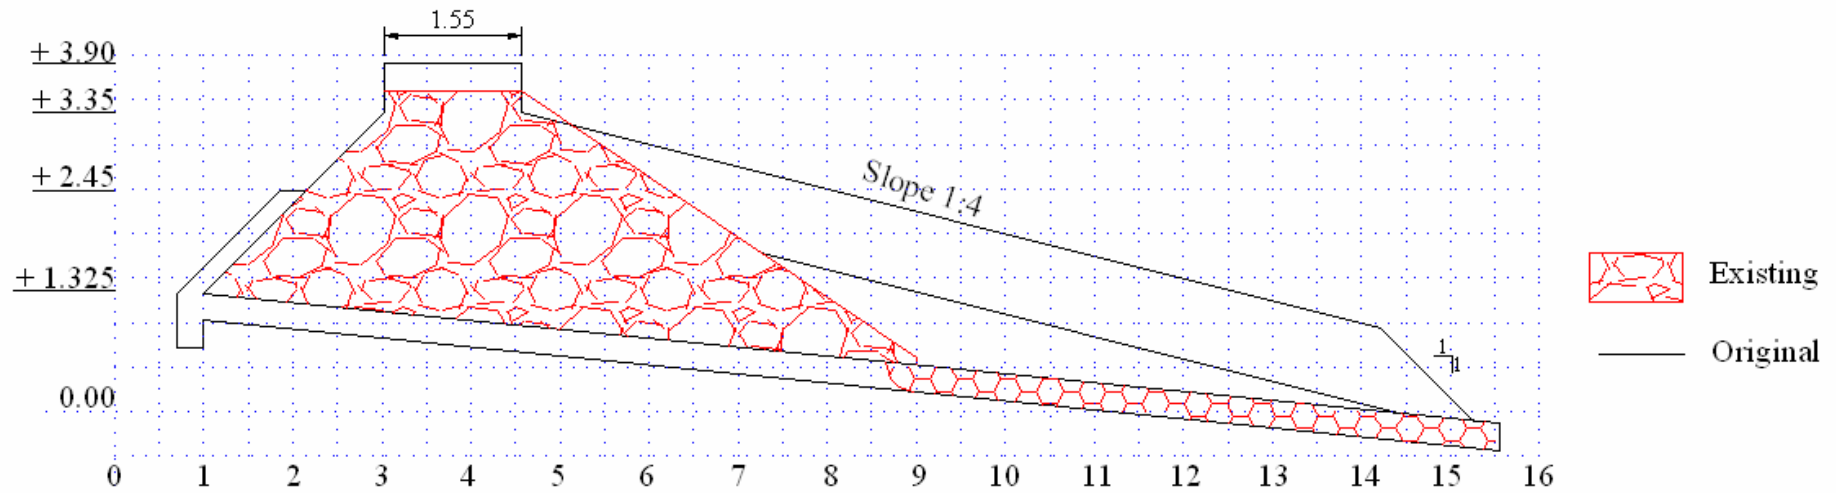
Cross-section of the existing damaged seawall (as per KID) at Maruthadi
